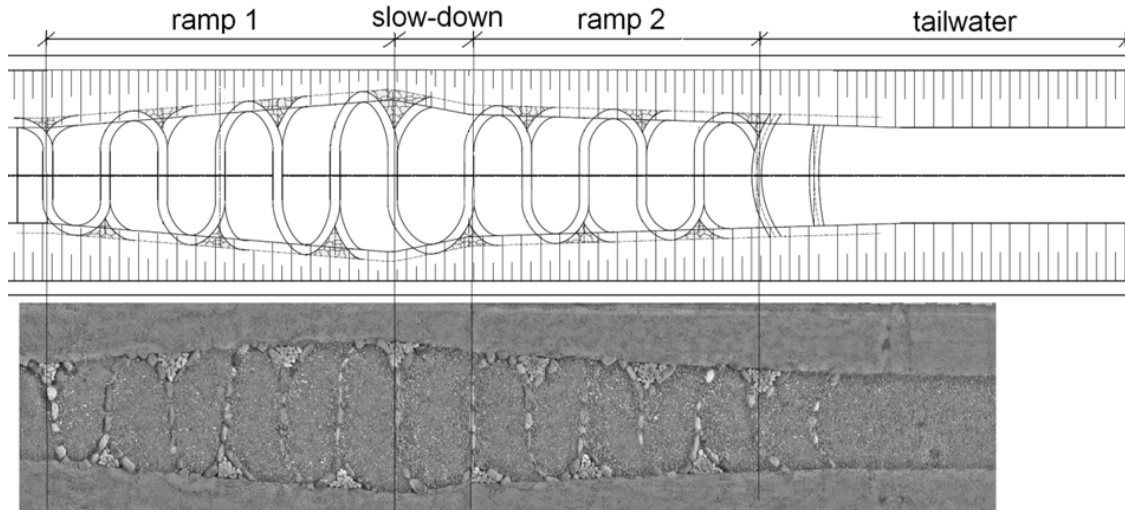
Plan view ramp design D9 - ramp area and tailwater section
